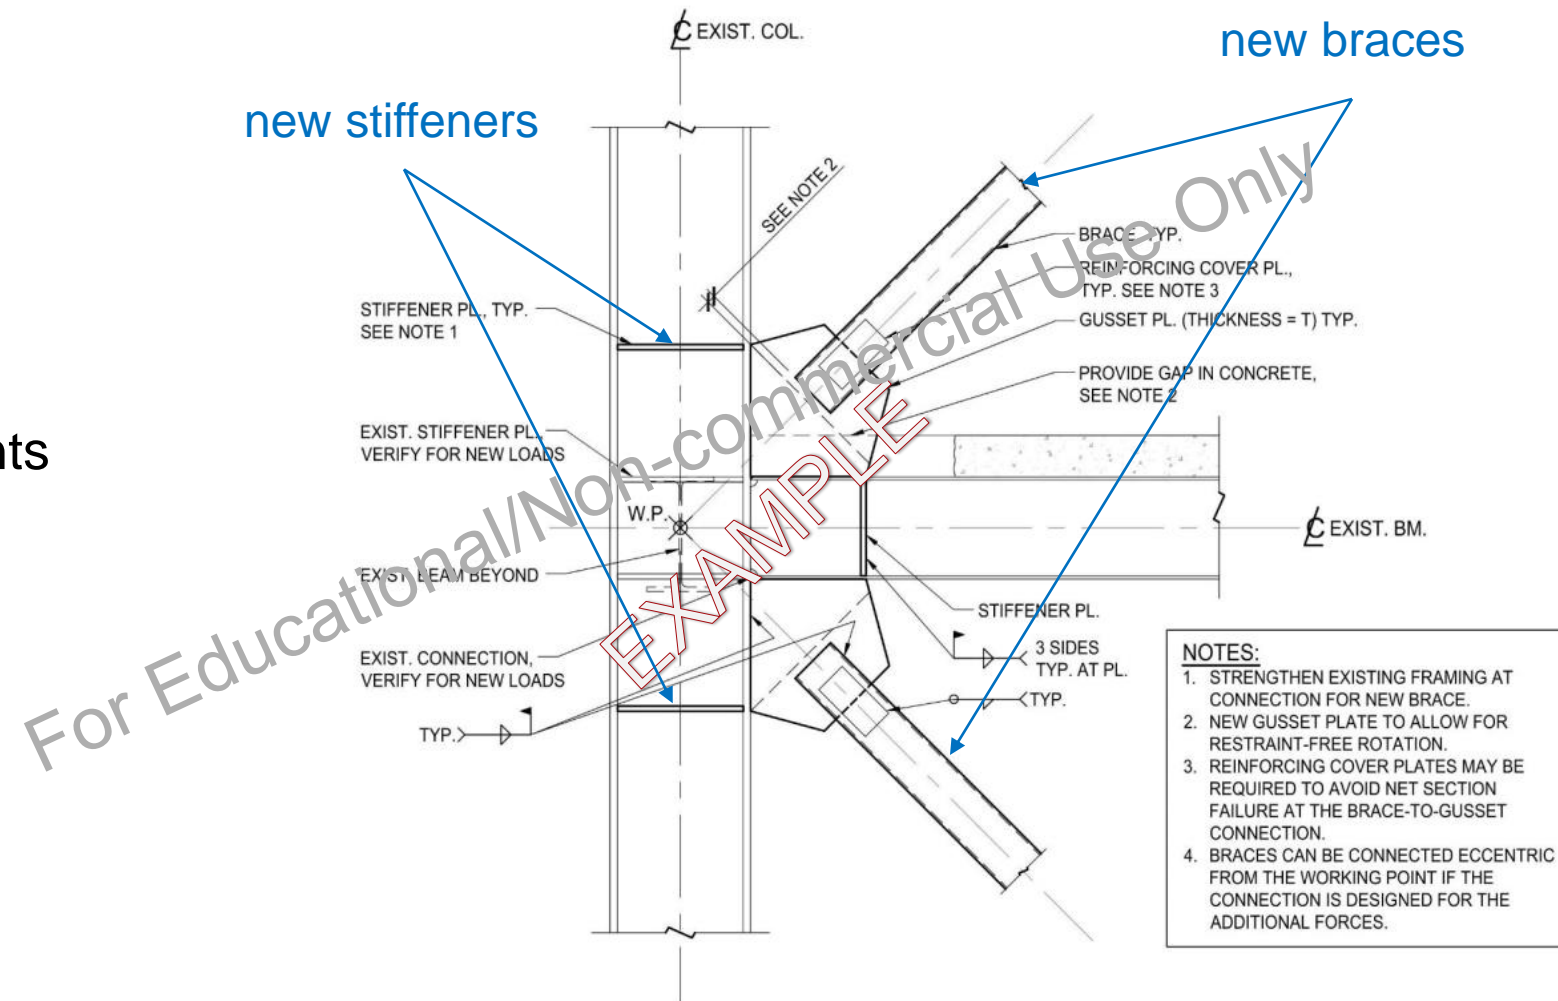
Connection of new steel brace to existing beam-column junction in moderately ductile CBF
